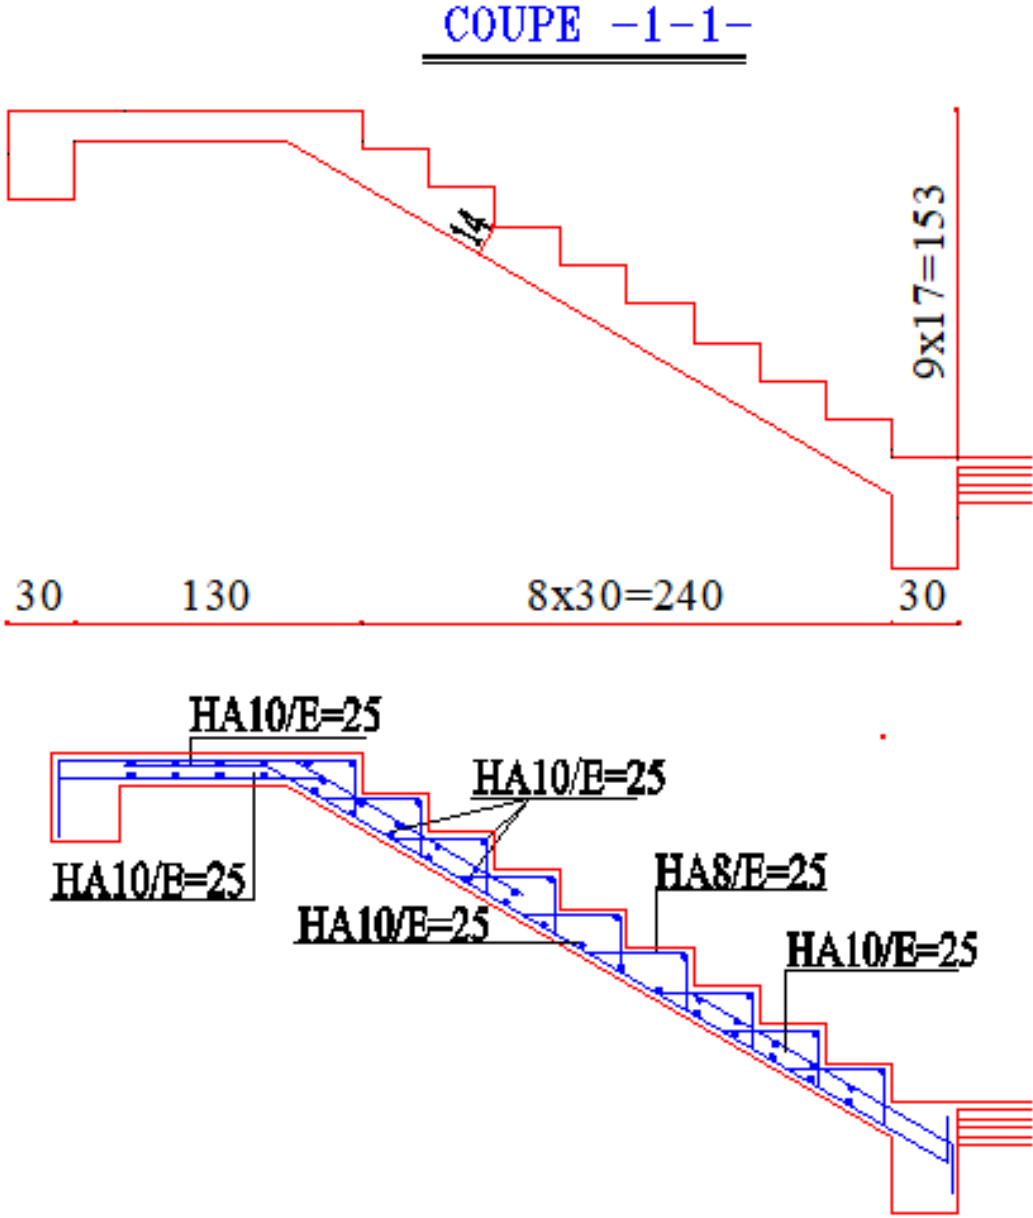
Reinforcement diagram of the stair cutting 1-1
